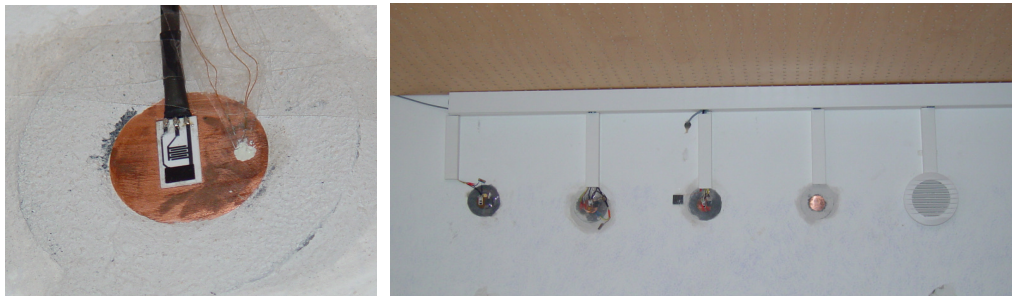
Photo of an artificial thermal bridge with dewing sensor (left) and installation in the south wall (right).
